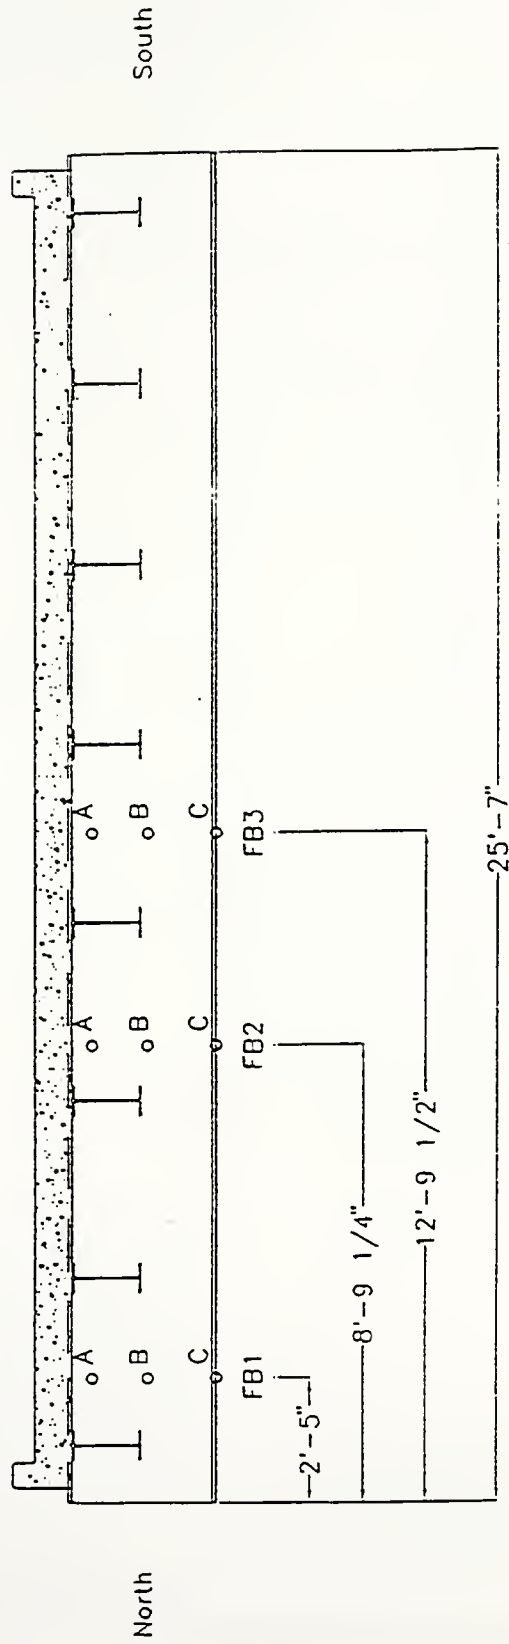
Floor beam longitudinal strain gage locations
